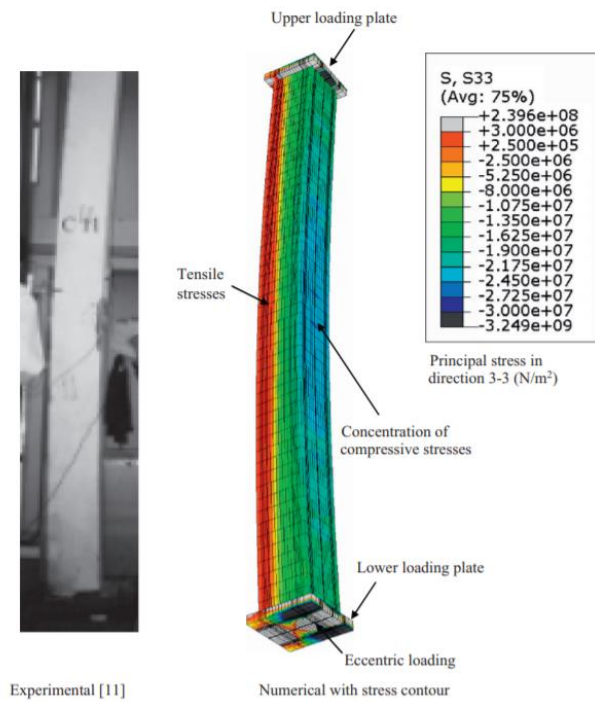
Comparison of deformed shapes at failure for eccentrically loaded concrete encased steel composite column BC5. Ellobody, Young and Lam (2010)
